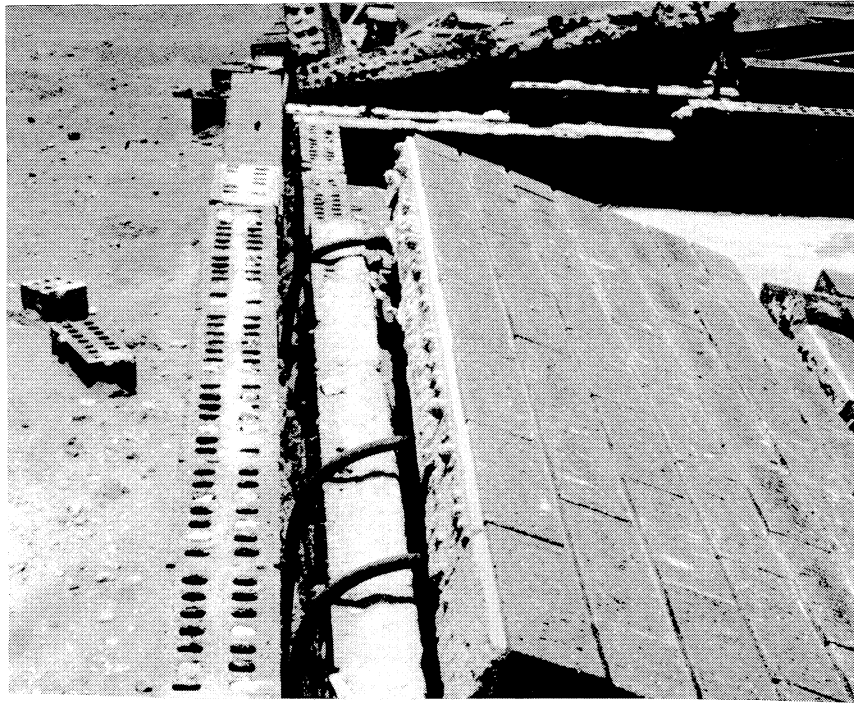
Damaged Brickwork On A House Under Construction
